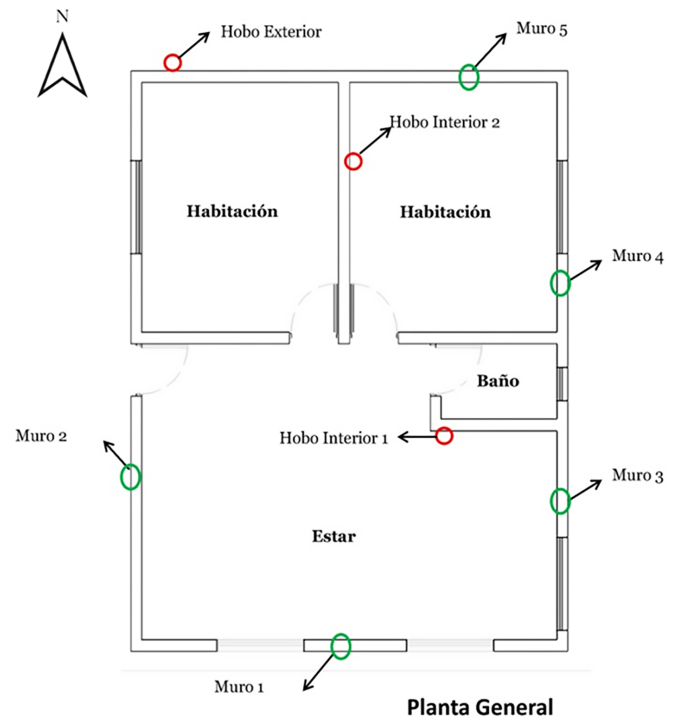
General floorplan of the dwelling with the HOBO layout and wall designation. Source: Preparation by Costantini Romero.
